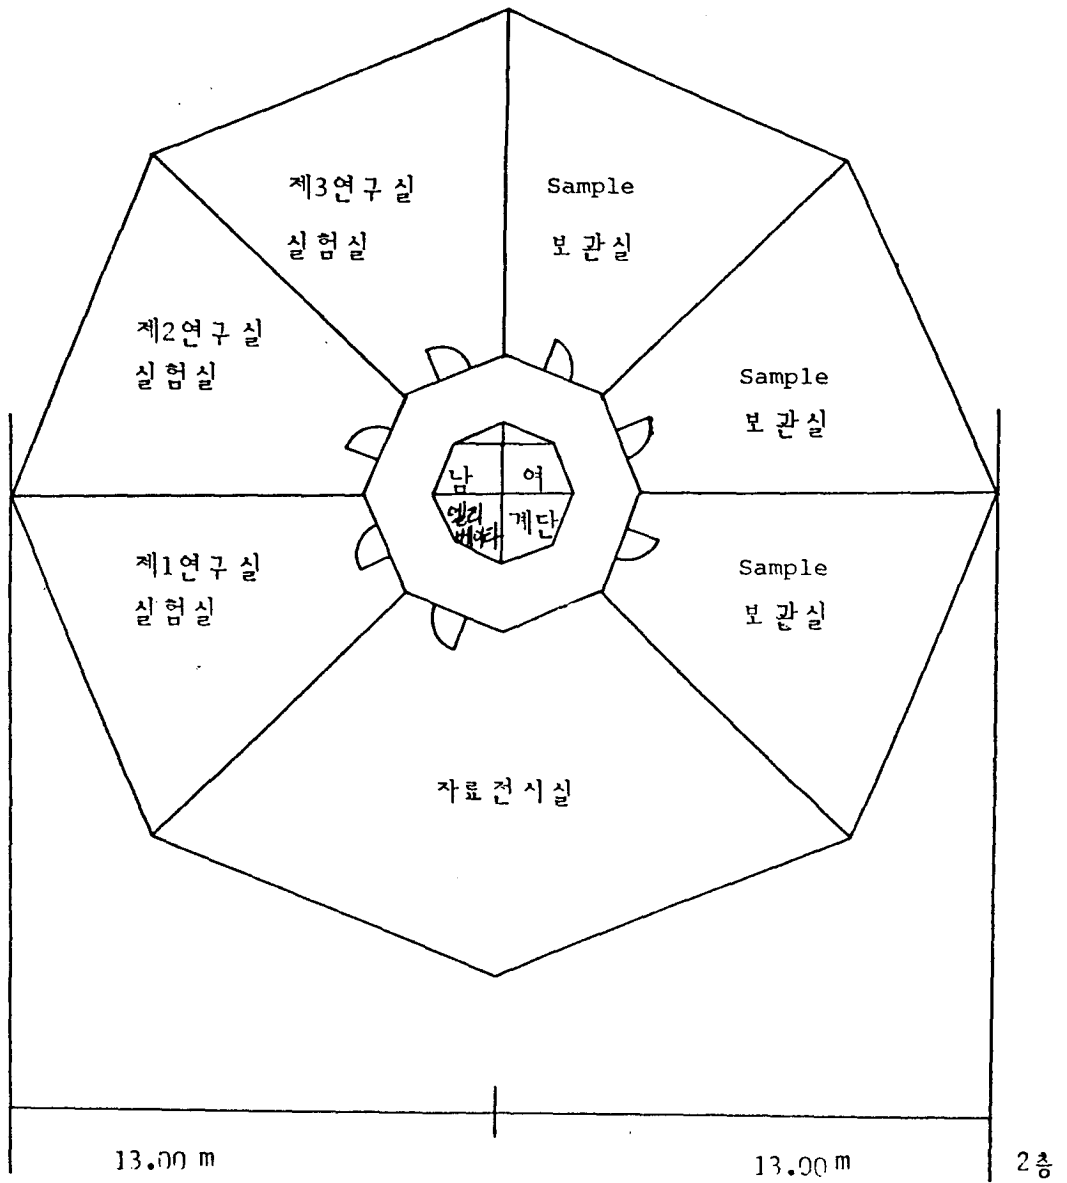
The second floor arrangements of the proposed polar research building.
